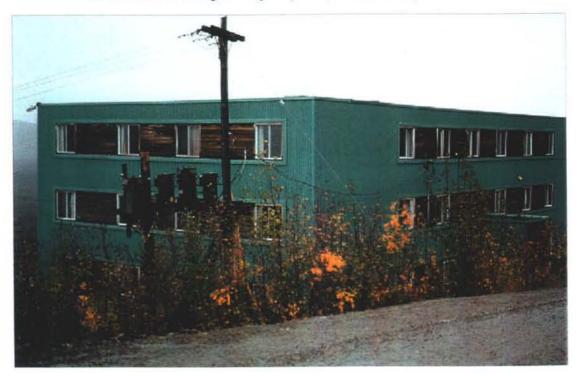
Elsa. Building #7 is one of the newer bunkhouses. Note transformers in the foreground. (Azimuth  $010^{\circ}$ )
